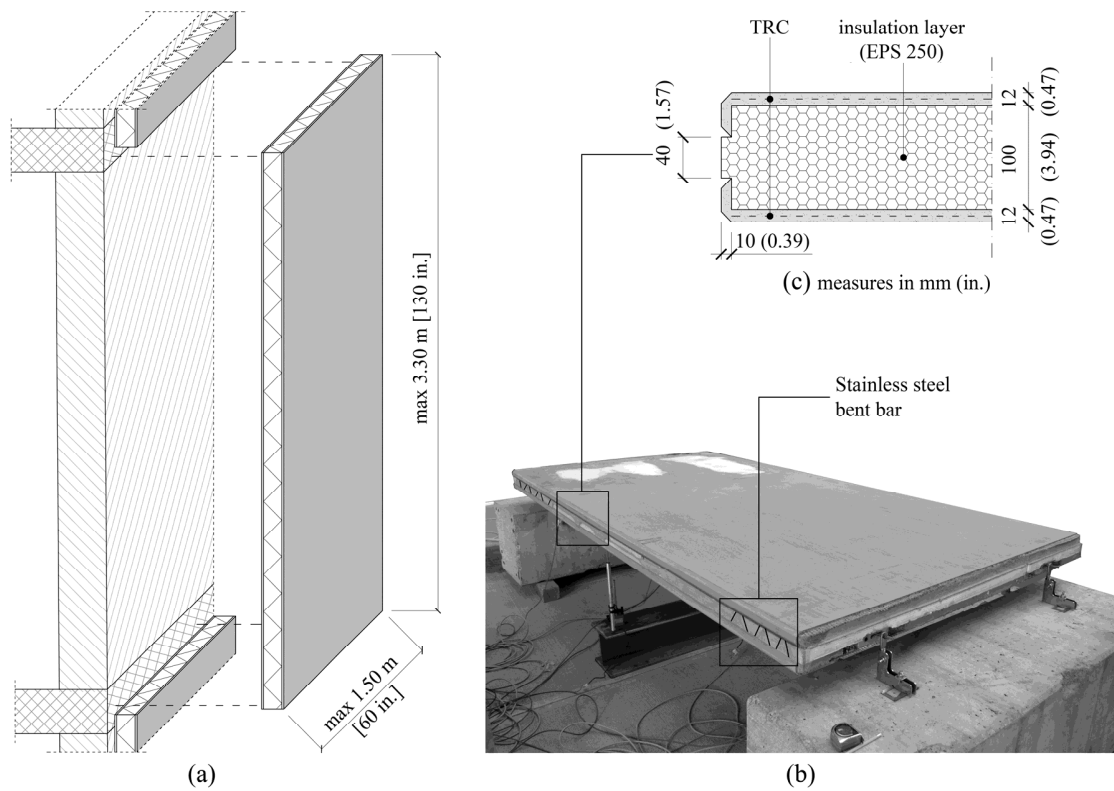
Sandwich panel solution proposed for the energy retrofitting of existing buildings: sketch (a), full scale panel fastened to concrete beams (b) and detail of the panel edge (c).
